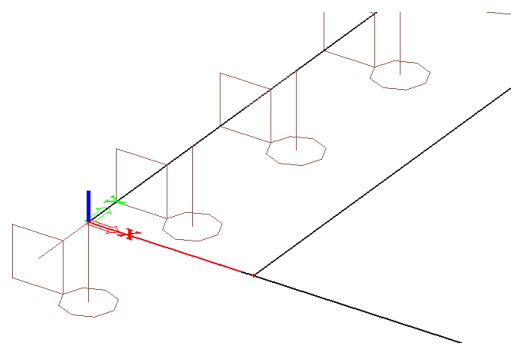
Detailed view of the point supports for the flexible side girder
